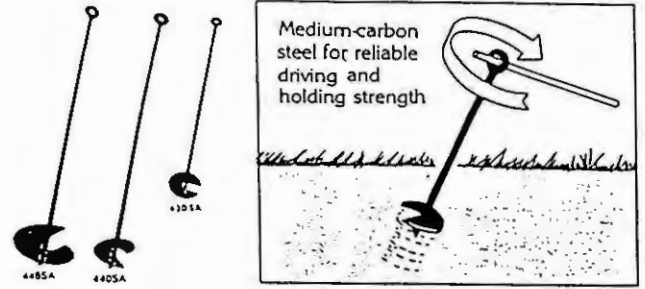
To install earth anchors, screw anchor clockwise into the ground so that the pull is in line with the anchor rod.
